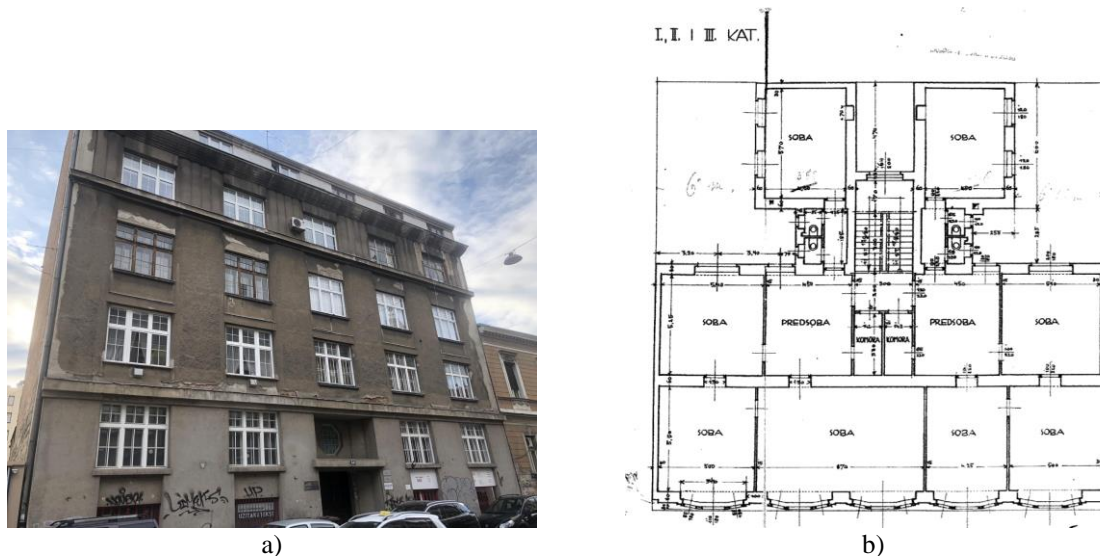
a) View of the building; b) Layout of the typical story (Courtesy of Zagreb City Archives).
